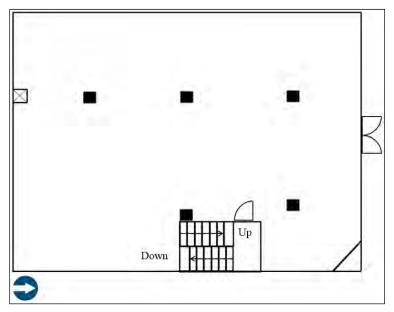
FIRST STORY PLAN (NOT TO SCALE)
